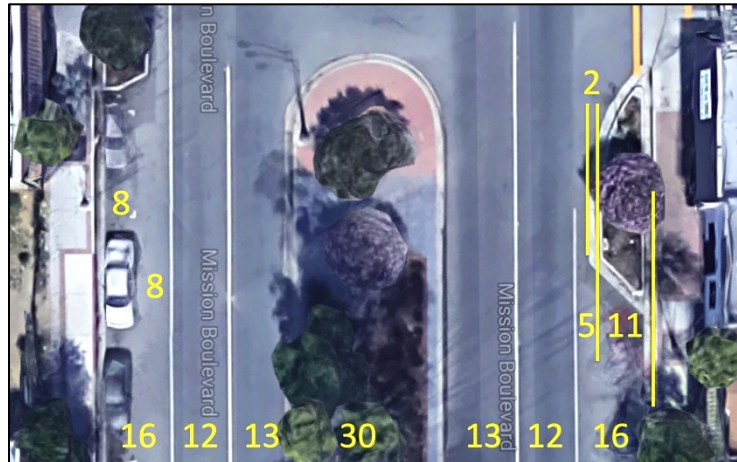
Mission Boulevard cross section near Packard Avenue
